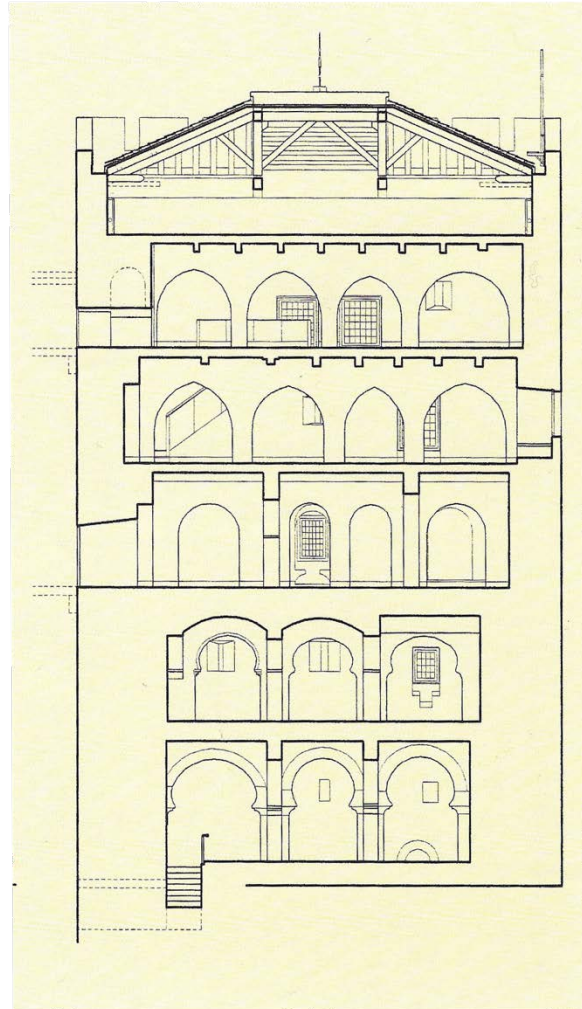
Sectional elevation showing the different floors of the Troubadour Tower
